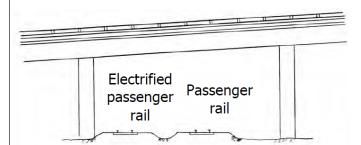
Bridge elevation view with an electrified passenger rail track and a non-electrified passenger rail track below the bridge.
